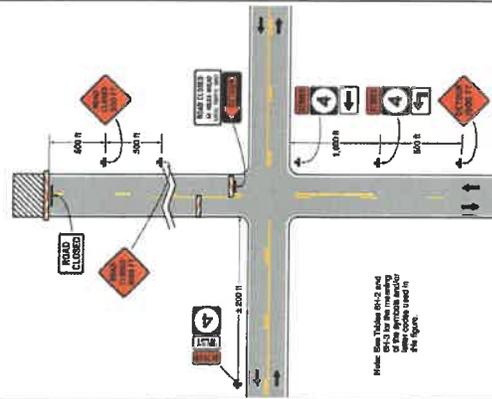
H-8. Road Closure with an On-Site Detour (10-4)
